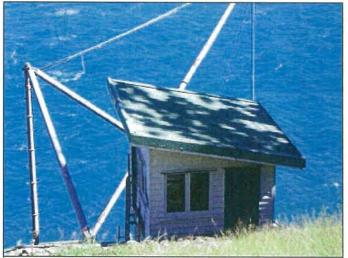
Winch House, edge capping on roof Photo S-7517: Roof sheets
